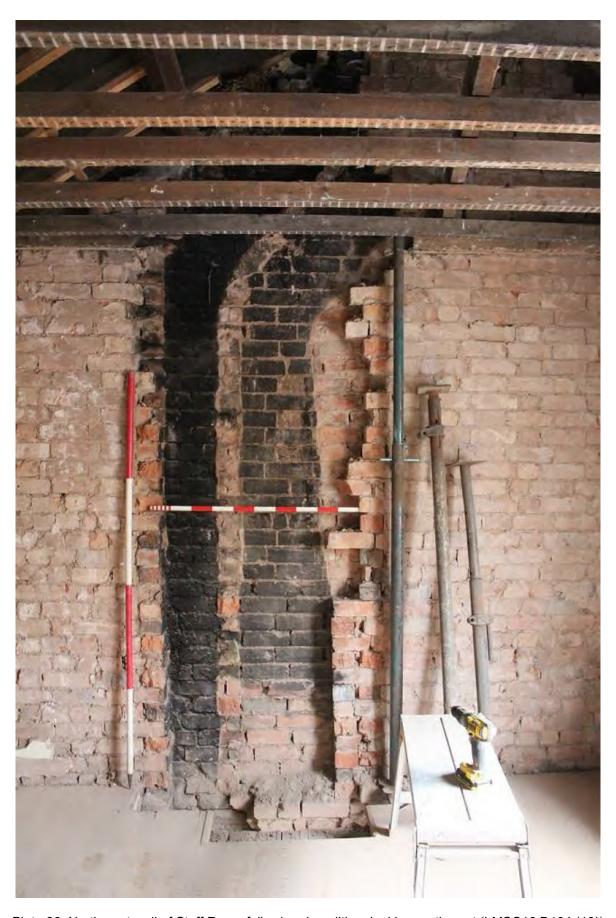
North-east wall of Staff Room following demolition, looking north-east (LMSC16 D104 (18))
